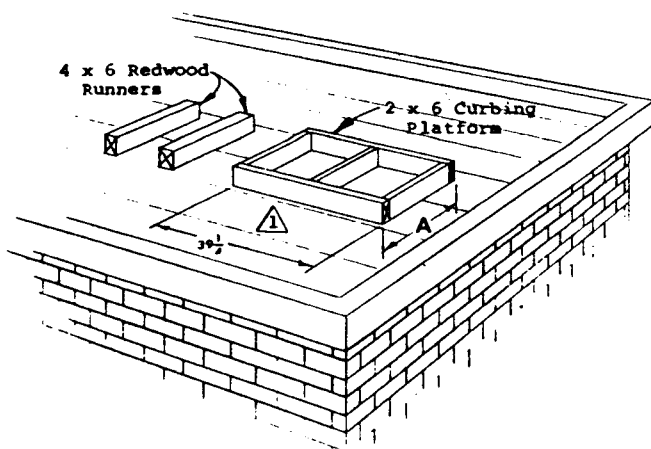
CURBING DETAILS (FIELD FABRICATED)
